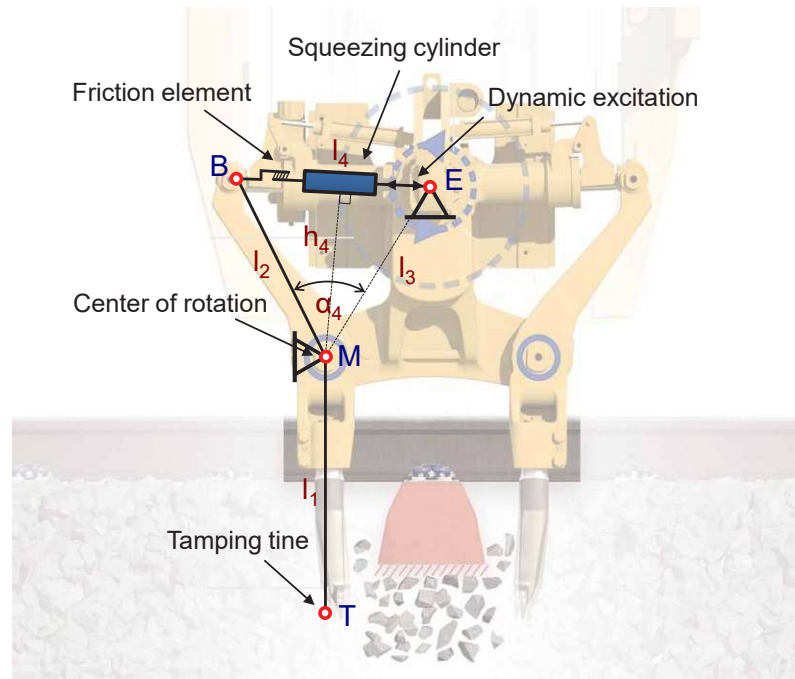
Mechanical model of the tamping unit lowered into work position
